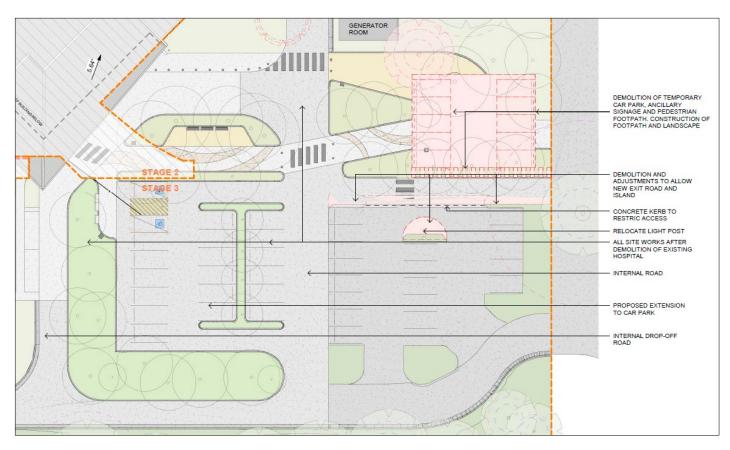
Approved site plan showing location of carparks and pedestrian paths in the south-eastern section of the site
